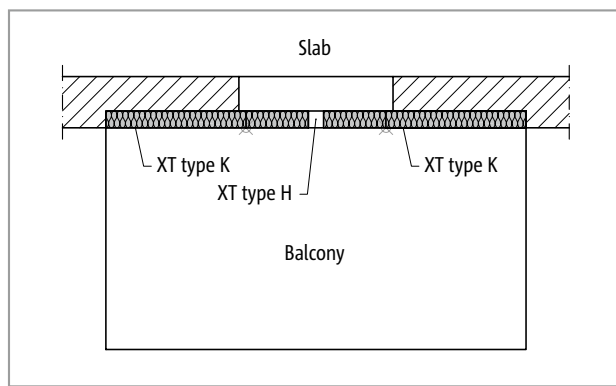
Schöck Isokorb® XT type H: Balcony freely cantilevered
